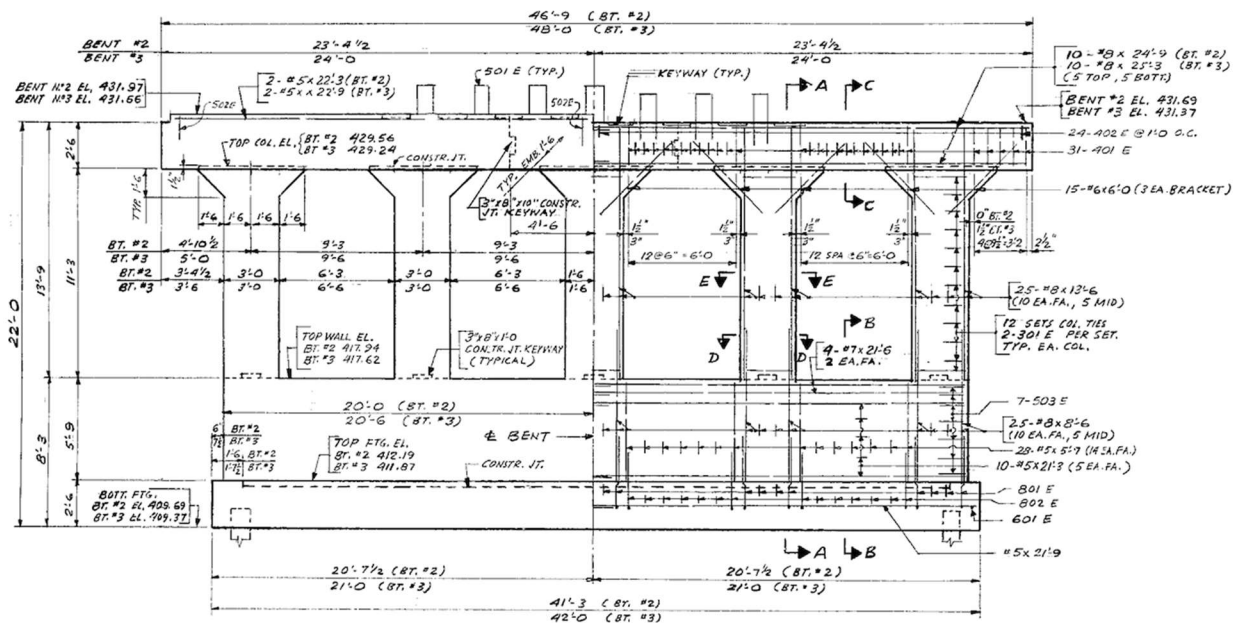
Transverse Elevation of an Interior Pier of Bridge (NBI 14650) (1964).
